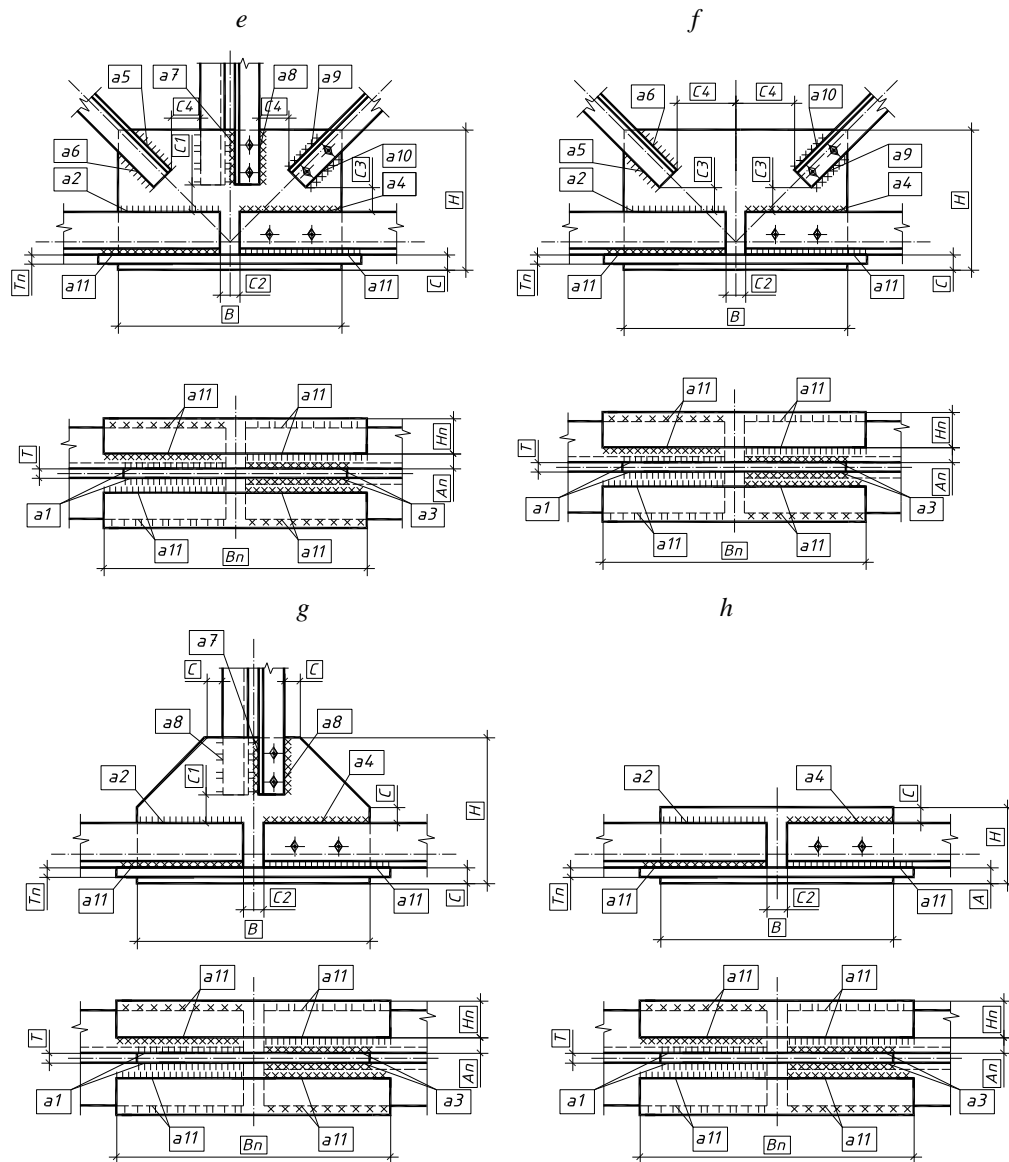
Erection joints in trusses with elements made of double angles
